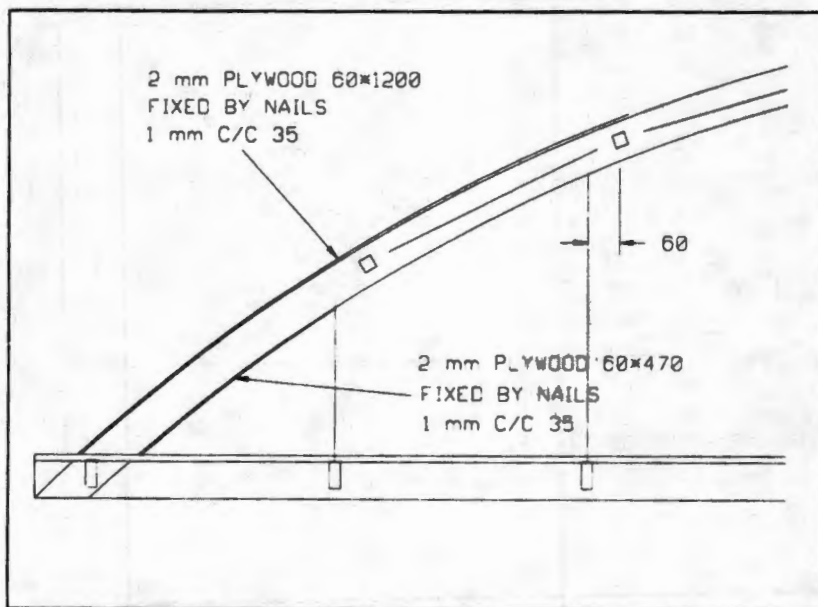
Detail of the arch footing. Dimensions in millimetres.
